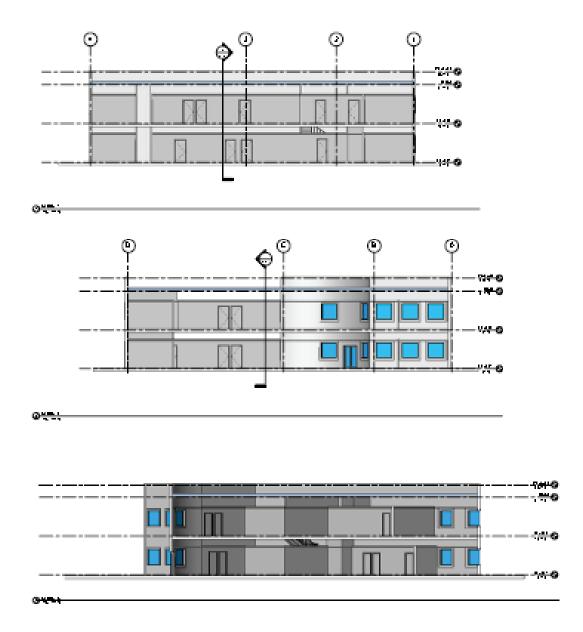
Sections Top (Section 1) Middle (Section 2) Bottom (Section 3)
